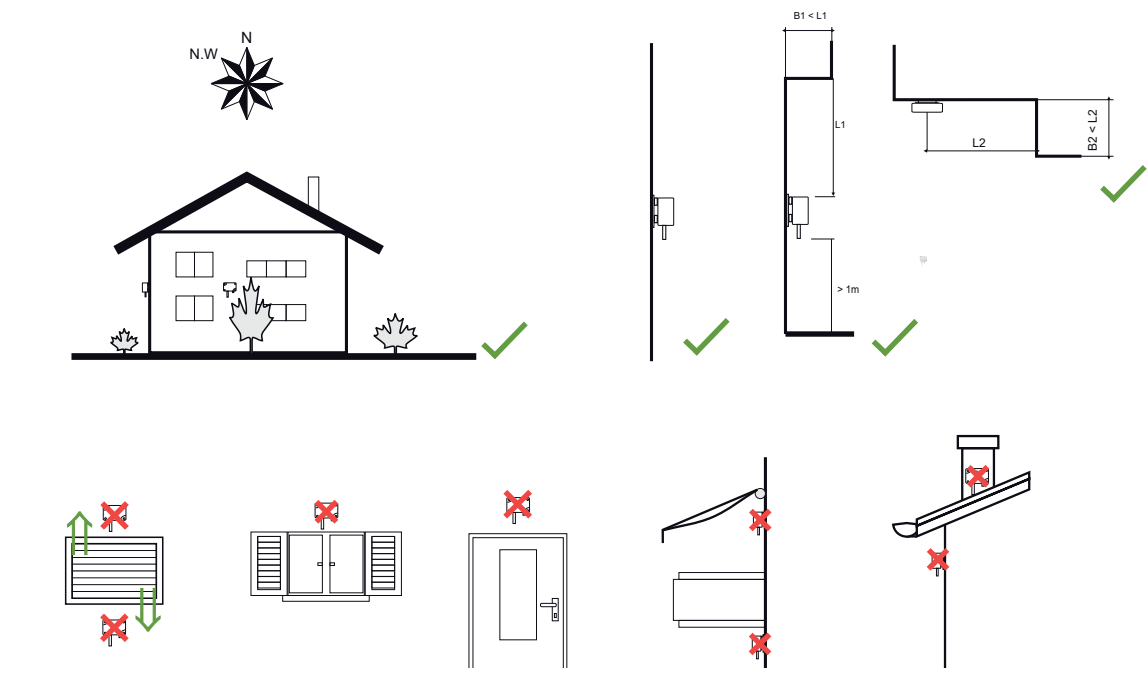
Correct or incorrect mounting position of the sensor outdoors
